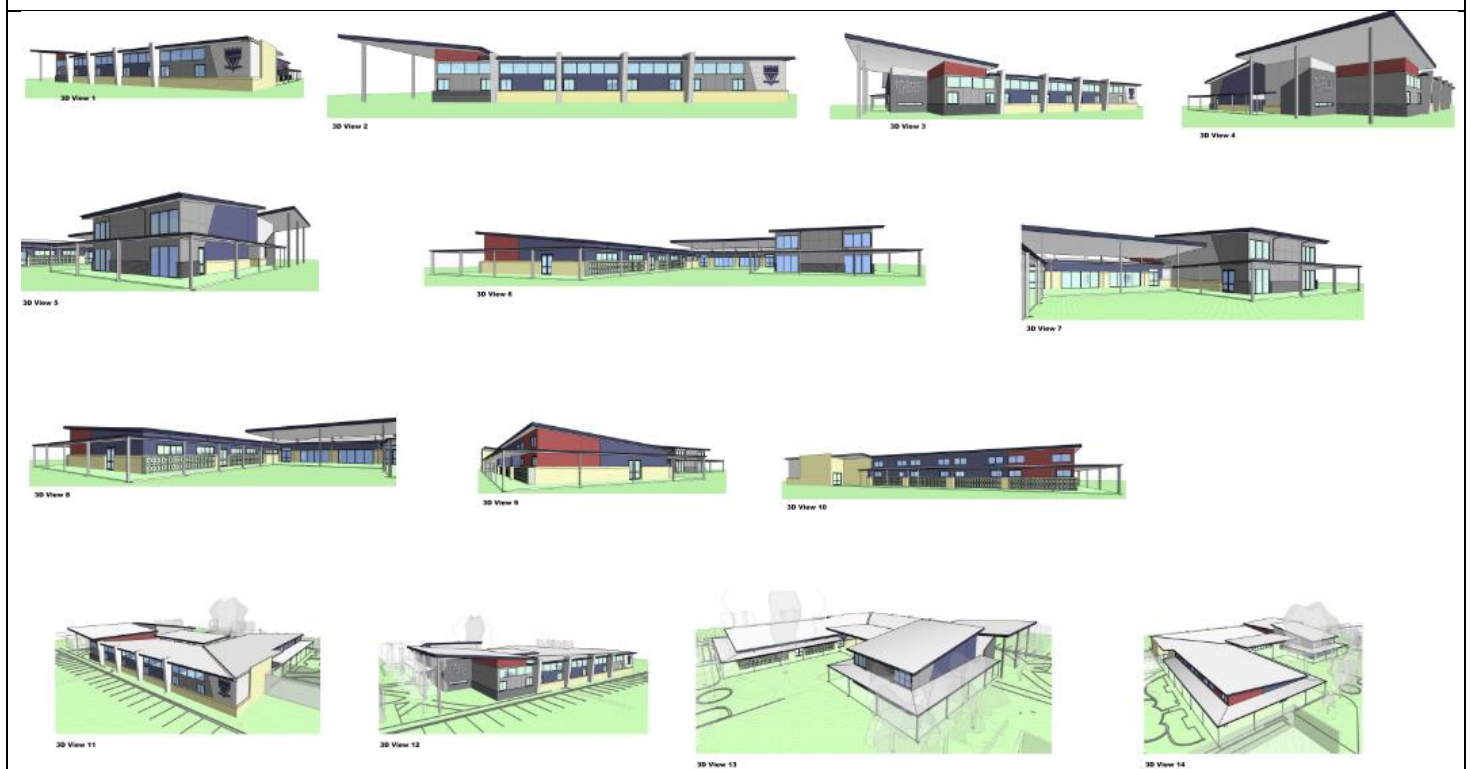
Proposed learning centre building renders (Source: Decision plans)
